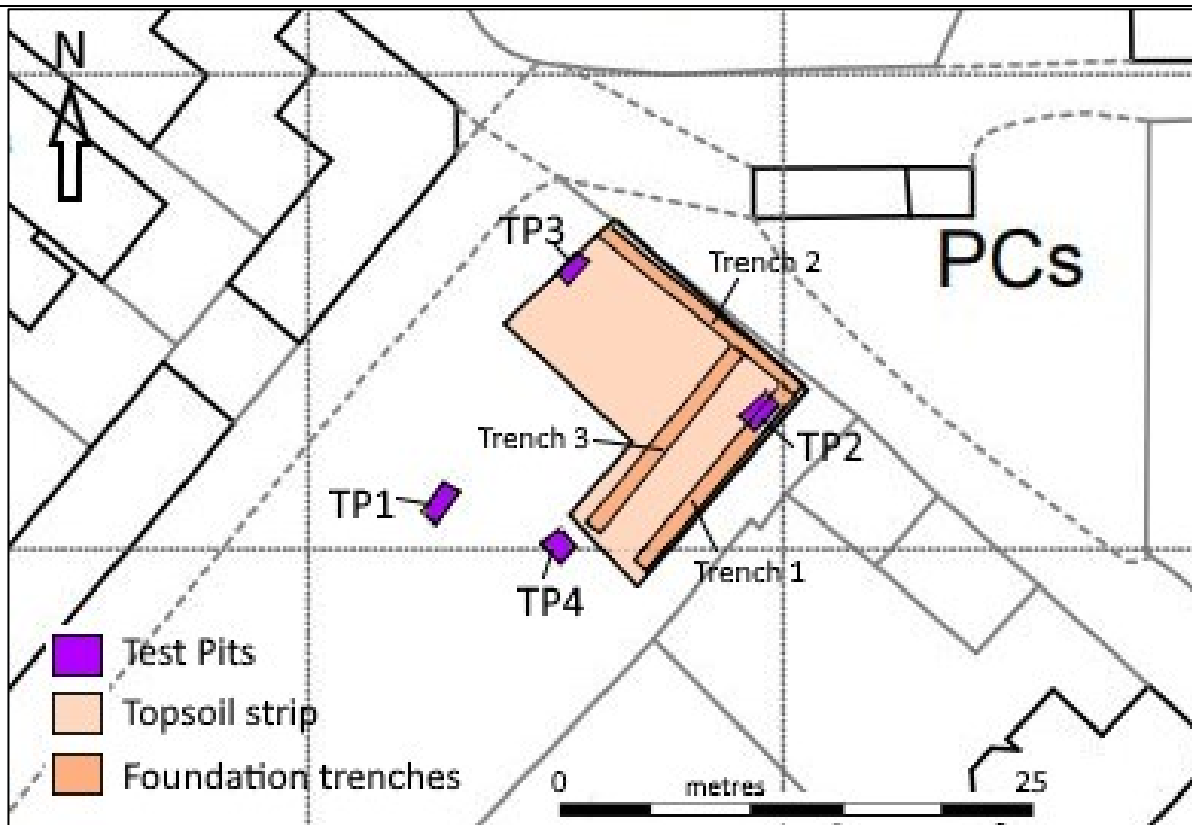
Plan showing the location of GI pits, foundation trenches and the topsoil strip area. Scale shown.
